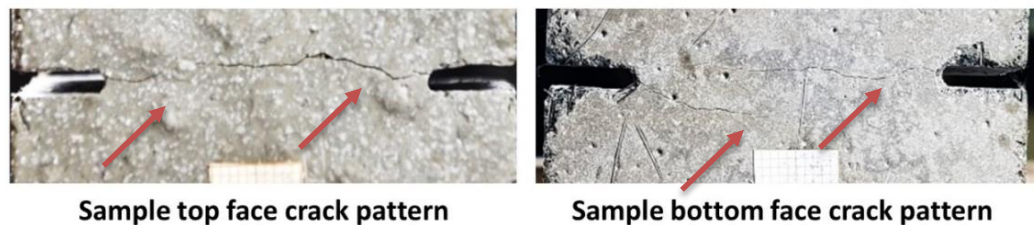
Typical tensile crack pattern of top and bottom of specimens
